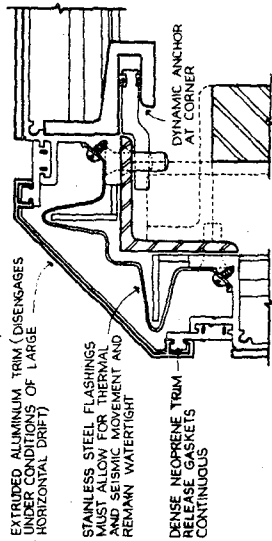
HORIZONTAL SECTION OF TYPICAL 45° CORNER PANELS.
